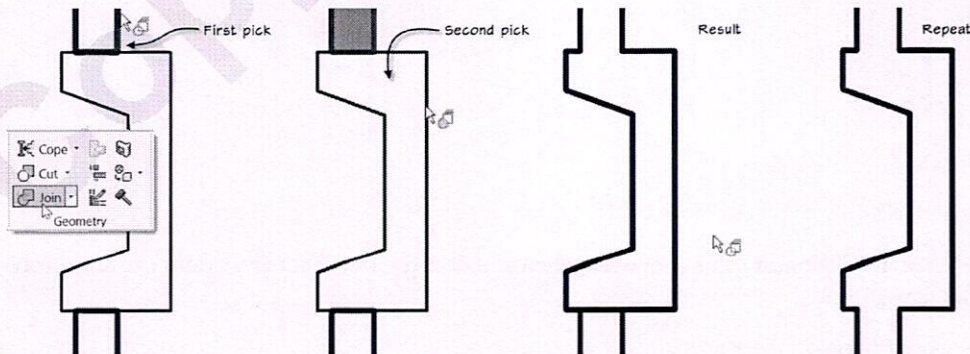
Use Join Geometry to join the walls to the Fireplace
